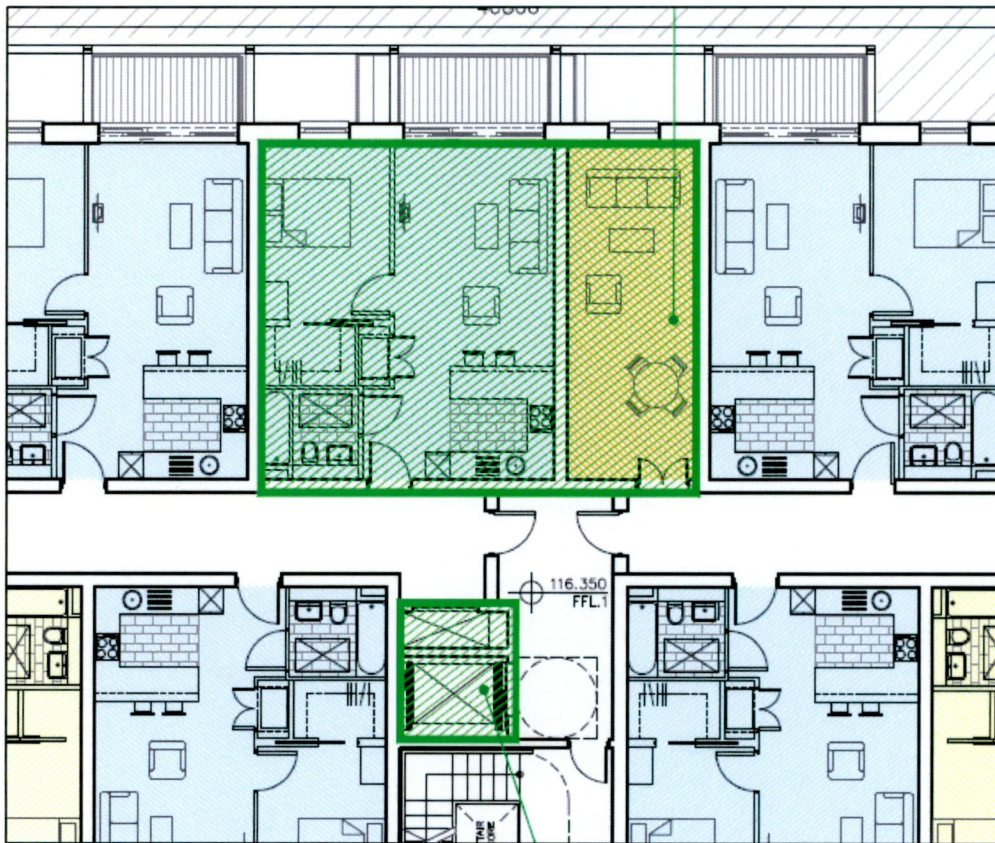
Extract from Drawing No. PA-102-CD (Proposed First Floor Plan C&D) showing typical changes through floor levels of Blocks C and D (source: Darmody Architecture cropped and annotated by TPA, 2022.)
